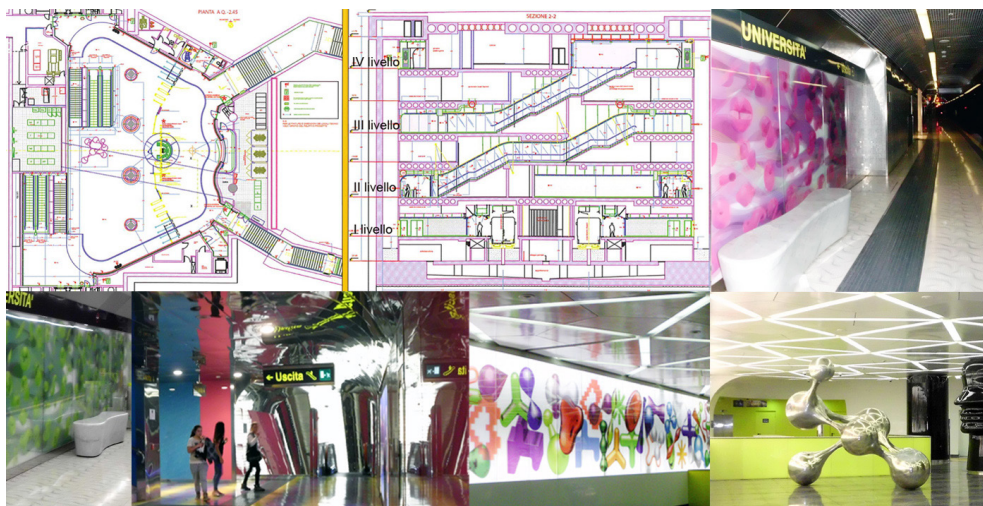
Università station. Above: Mezzanine floor plan and section on the descendants, below: views on some rooms of the station. (Drawings from Rassegna ANIAI n.2/2011, photos by authors).
